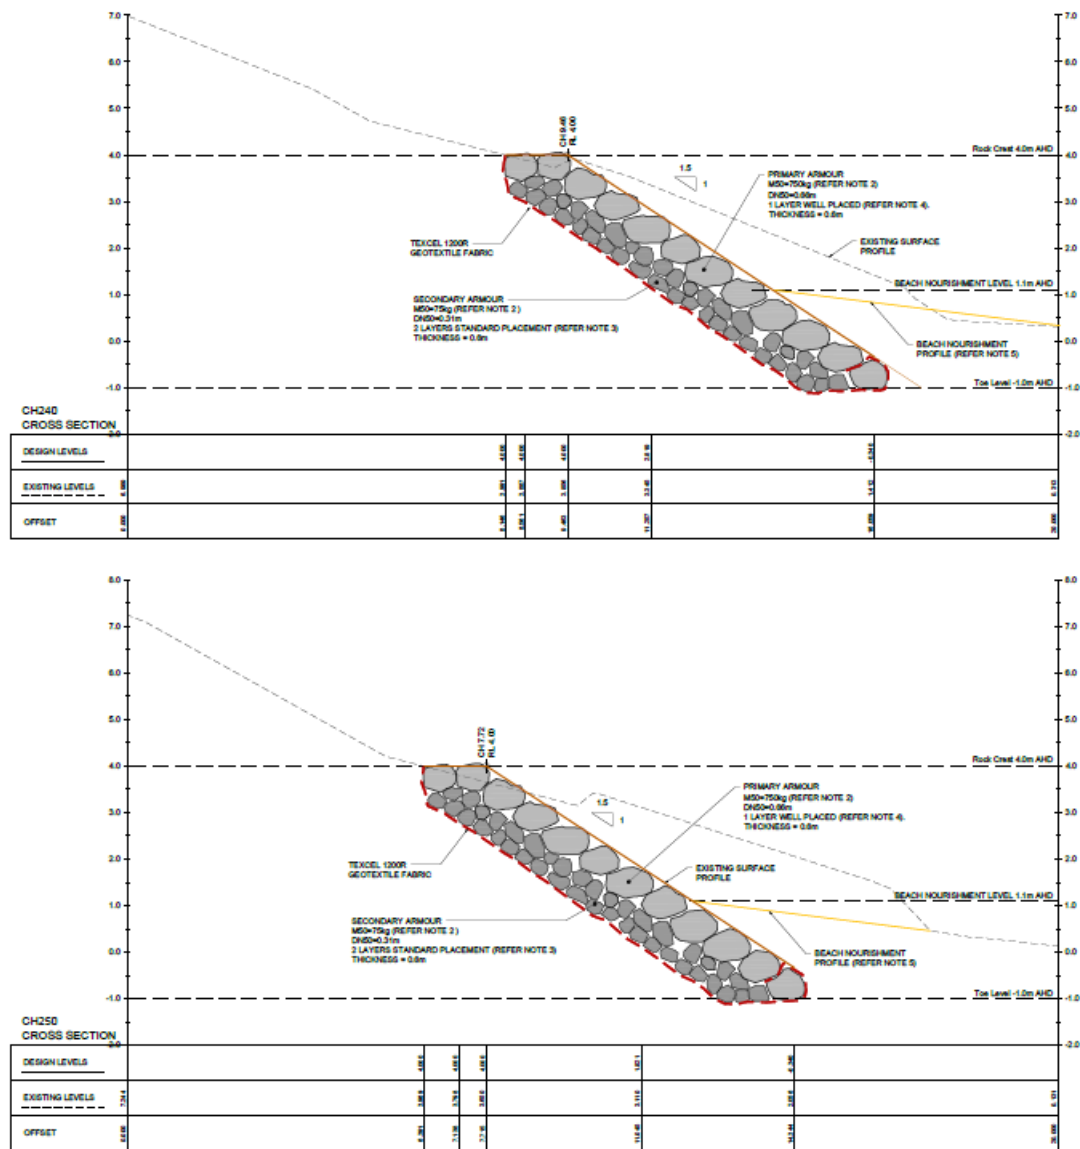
Eastern End Sections Sheet 2 (Dwg No. PA2559-RHD-00-DR-MW-M3-CIVIL_MODEL(B))
